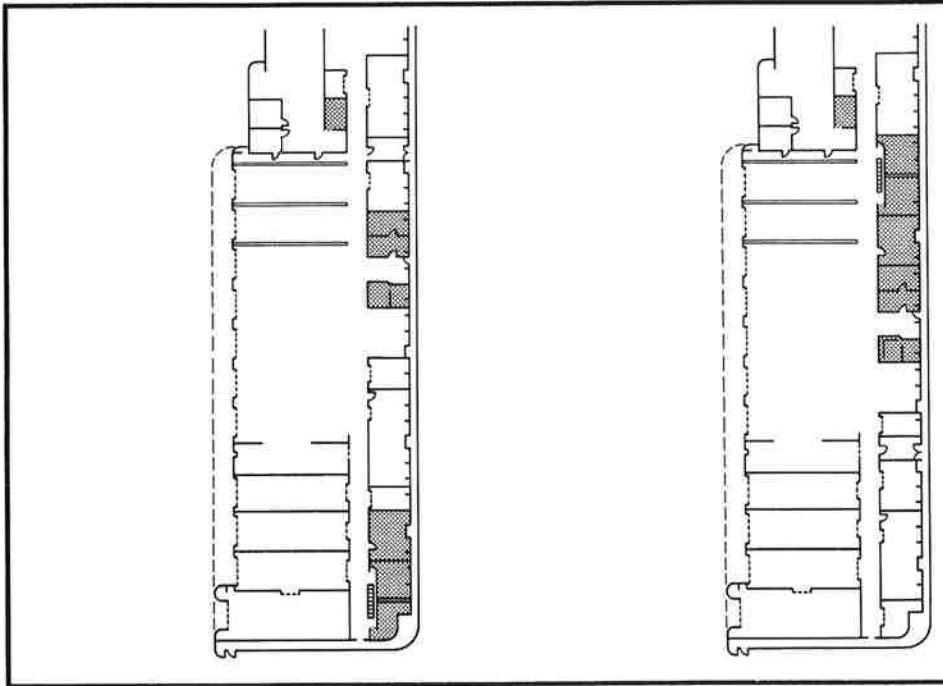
Shaded Areas Show the Arrangement of Air Conditioned Rooms in the Original Plan (Left) and the VE Proposal (Right)
